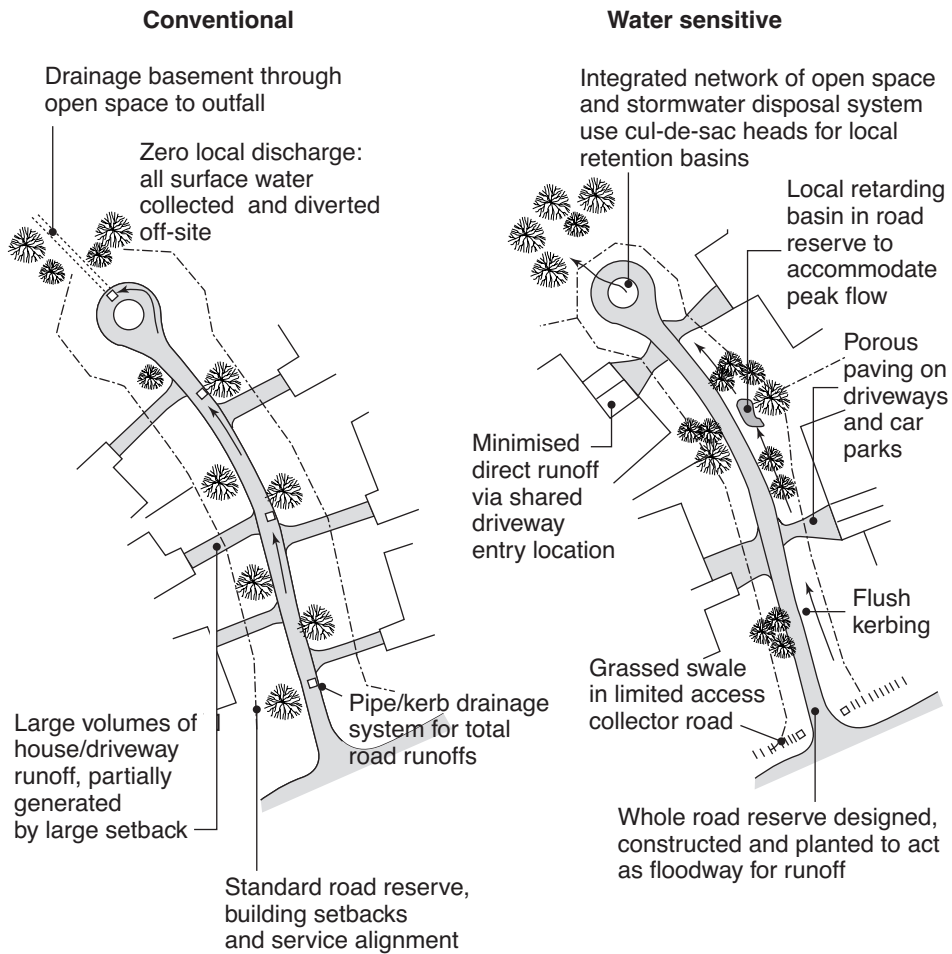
and 5.8 illustrate the application of water sensitive design to streetscape layout and design.
